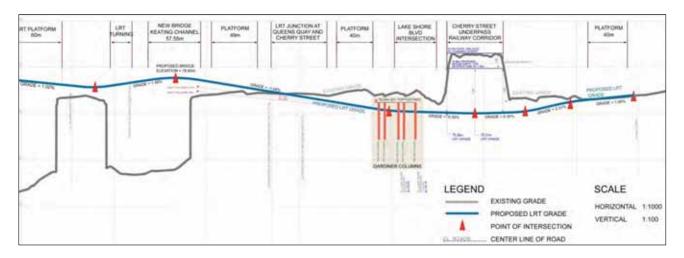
Cherry Street Road Vertical Profile Alternative 1
